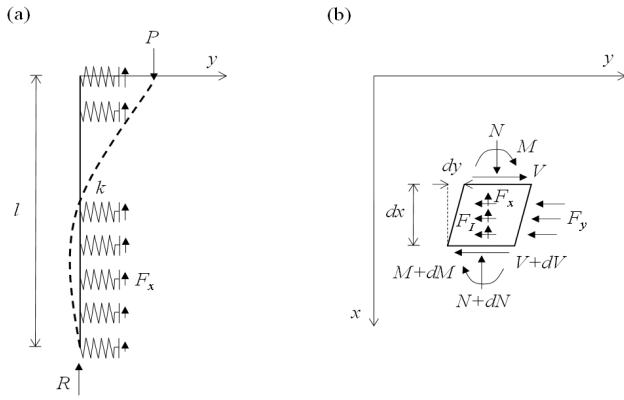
Axially loaded friction pile executing transverse vibration: (a) deformed shape and (b) forces acting on the small element
